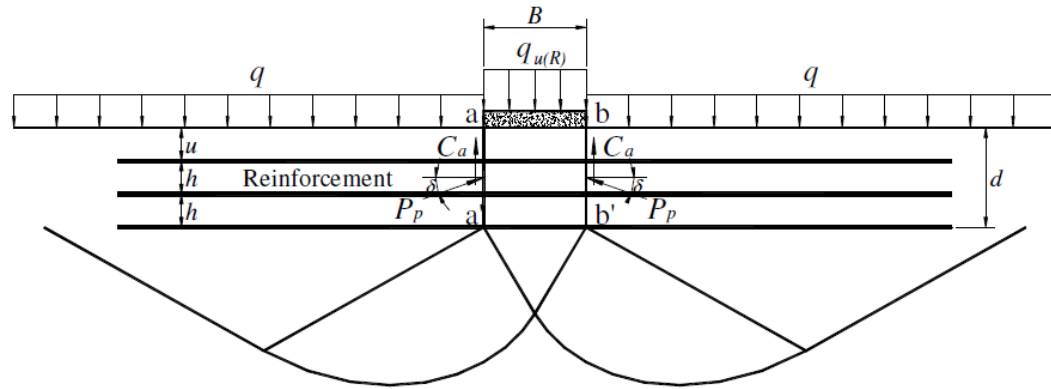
Failure mode of reinforced soil foundation: failure similar to footings on a two-layer soil system (18, 19).
